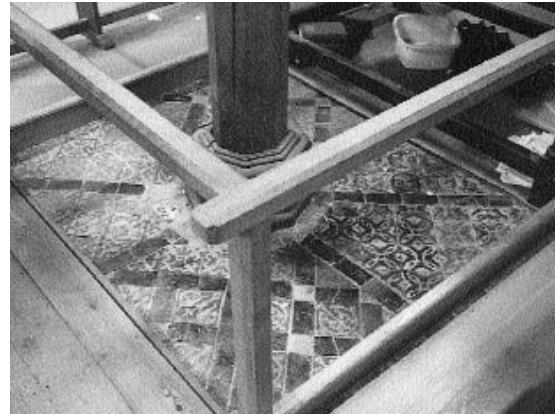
Salisbury Cathedral. Muniment room, thirteenth-century tiled pavement, protected by timber floor – see page 123 (Photograph, Jane Fawcett)
